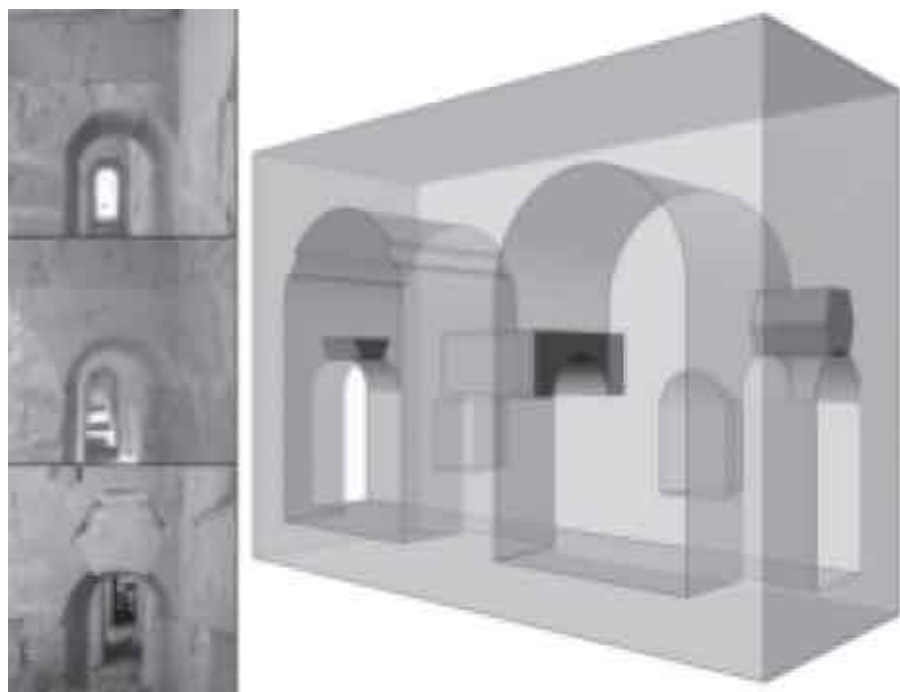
Resafa, city wall, monolithic arch-stone lintel and two other key stone types to be found within different sections of the wall-walk (C. Hof).
